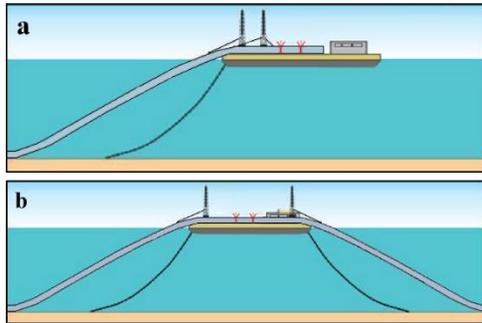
a. Emptying of the pipeline, inspection, preparation for welding, welding of new sections; b. Connection of the expanded section and the second end of the gas pipeline
